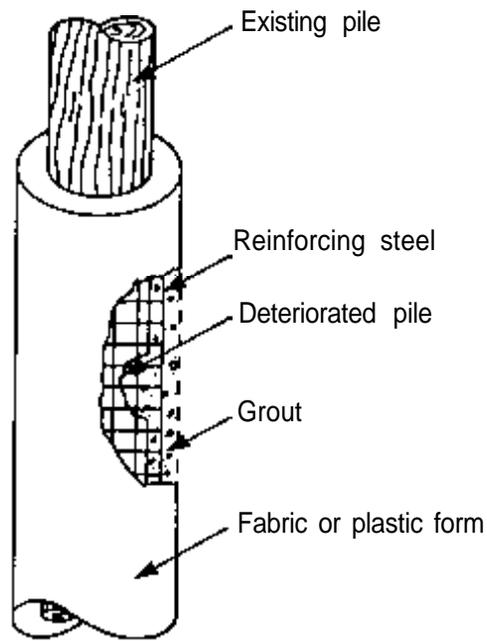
Reinforced concrete jacket for pile augmentation.
